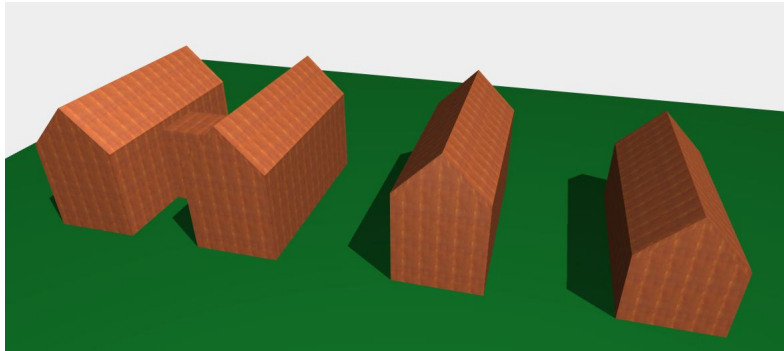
Modular progression of the typical one level unit/pitched roof construction
